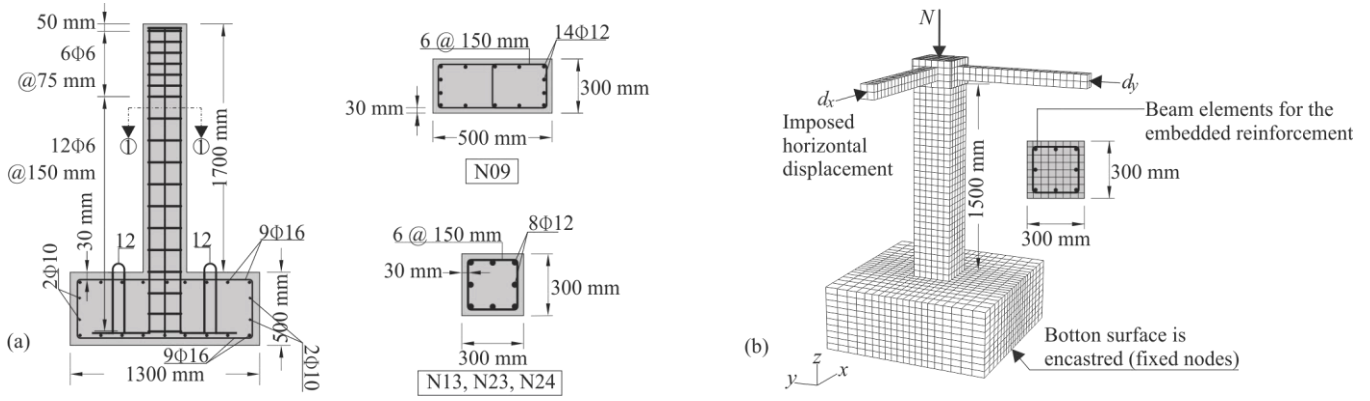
(a) Design dimension and reinforcing steel details of RC columns specimens. (b) Finite element model.
